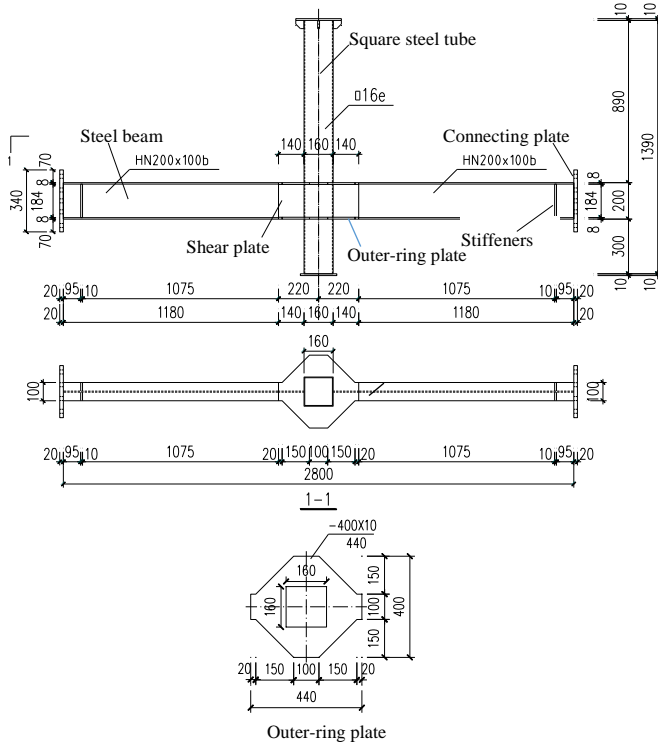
Dimension of specimens for rigid outer-ring connection (SJ01)
